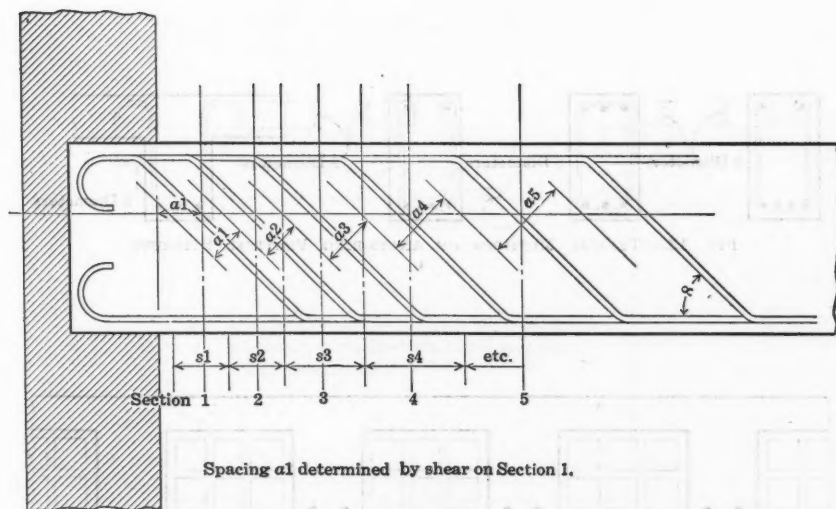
TYPICAL BEAM WITH WEB REINFORCED BY MEANS OF SERIES OF INCLINED BARS.
